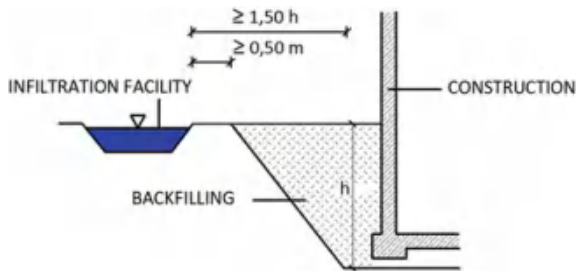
The minimum distance of the decentralized infiltration facilities from building without waterproofing (Standard DWA-A 138E 2005)
